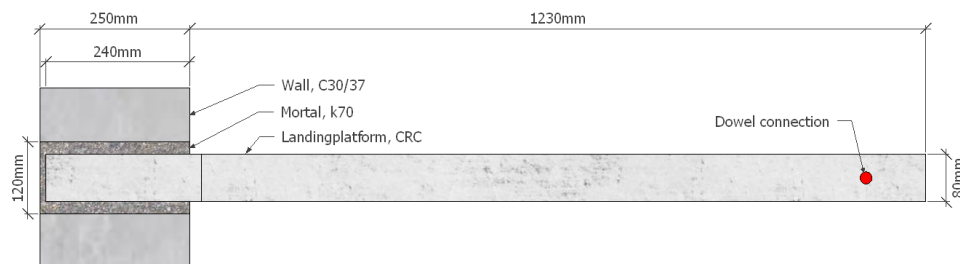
Actual connection of the Raqtan landing platform to the wall.
